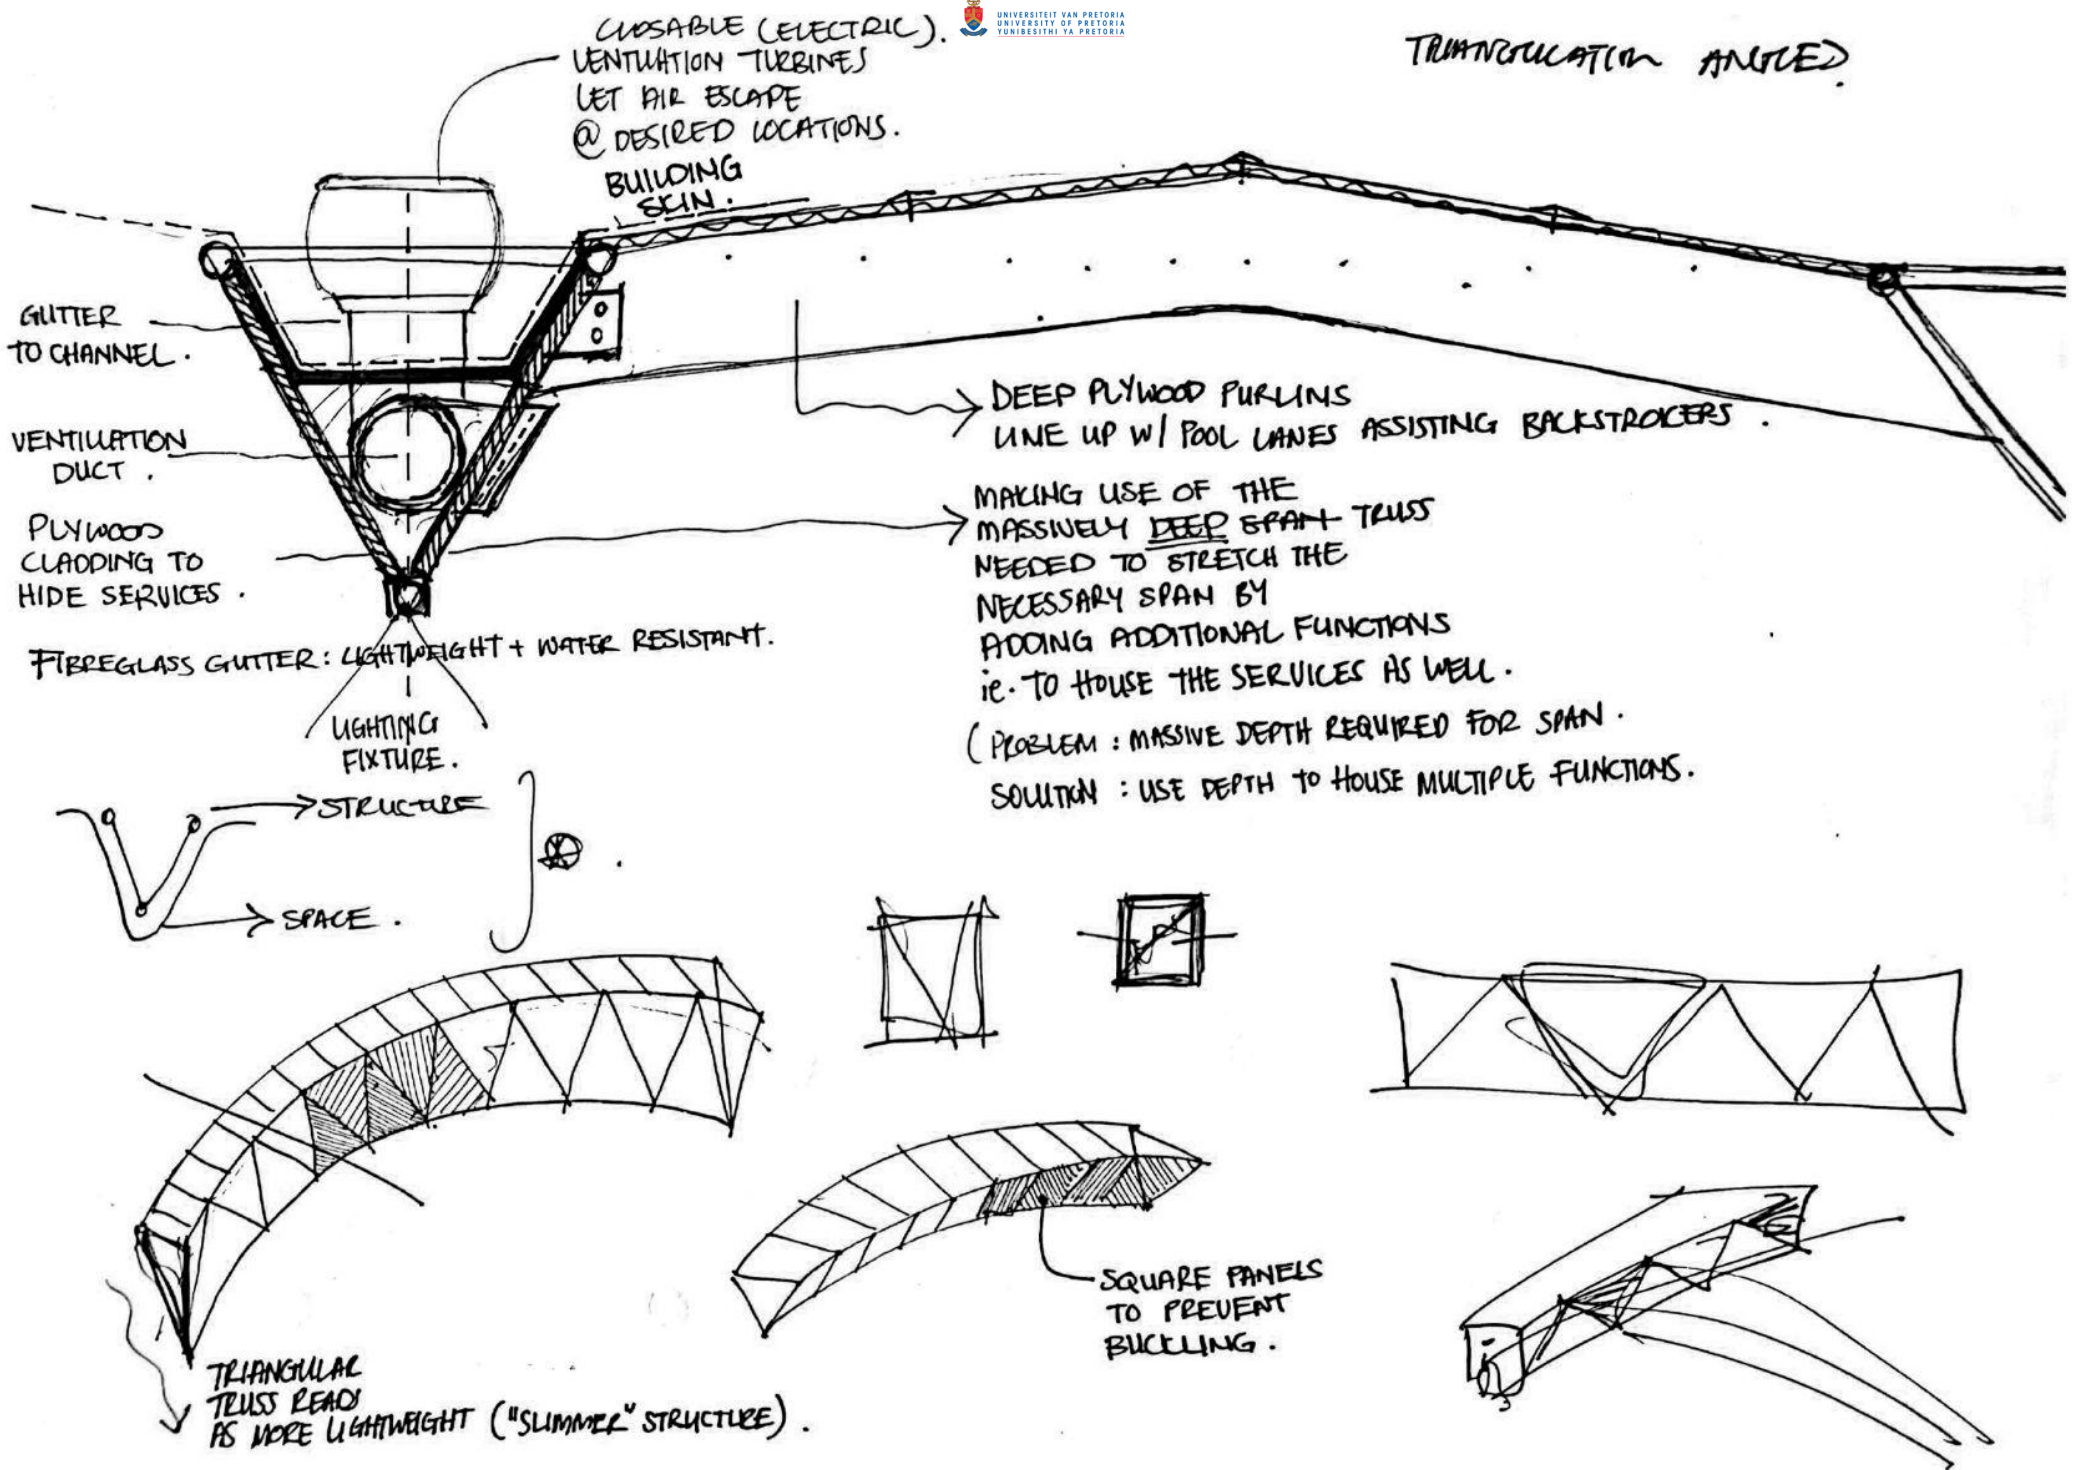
Iteration of the roof structure to determine how the roof and landscape will merge (Author, 2021)
